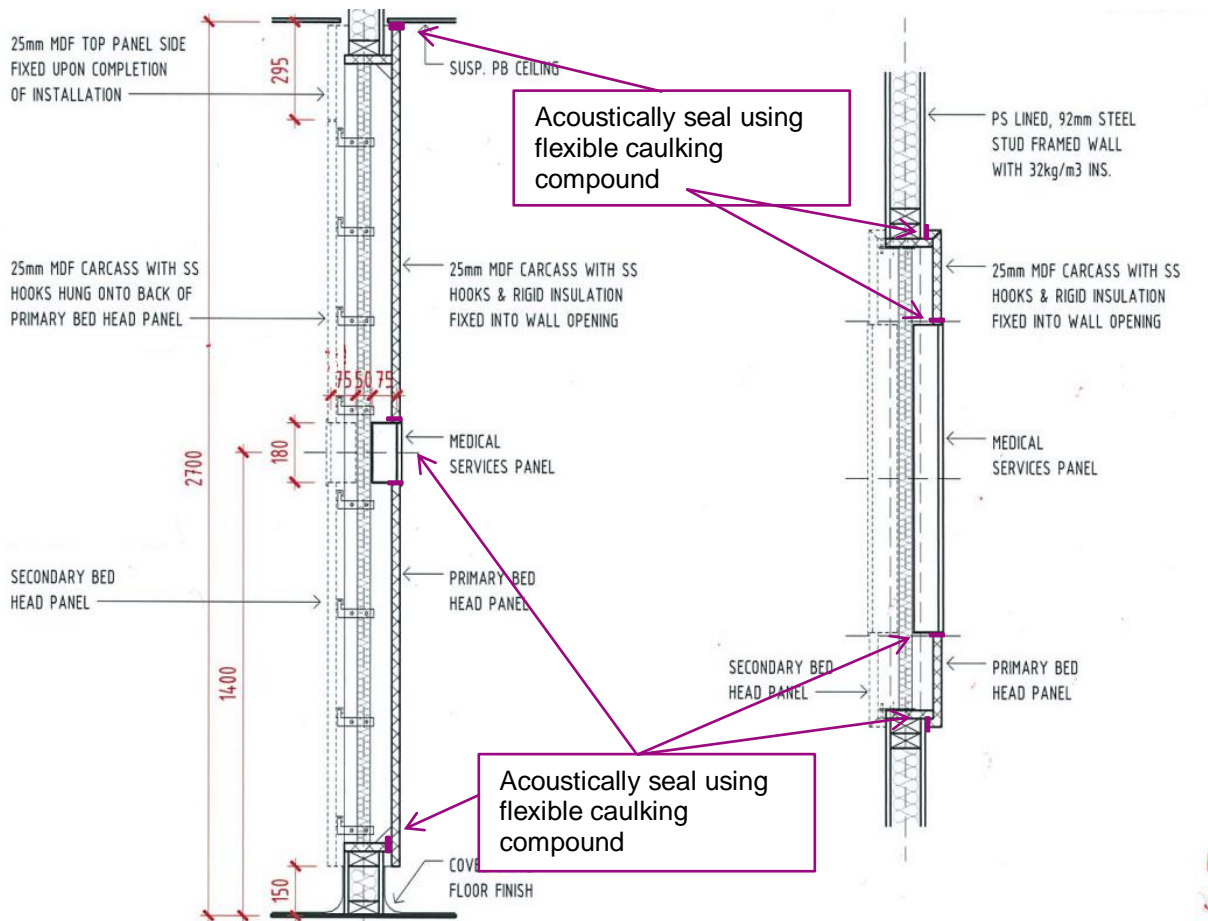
Acoustically seal joints between MDF Bed Head and Partition (Left image: Section detail; Right image: Plan detail)
